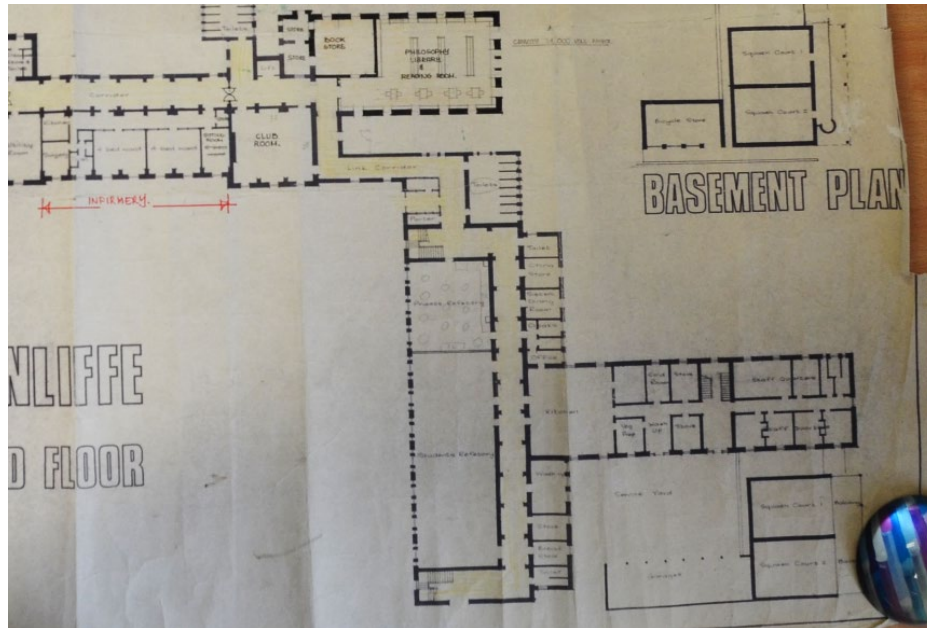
1969 Drawing by Nevin & Nolan Architects showing the ground floor layout of the 'Library Wing'.
